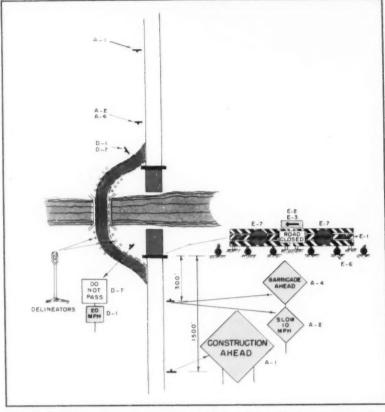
This shows the location, spacing and type of signs necessary for a temporary run-around, as where a bridge failure or culvert washout has occurred.
